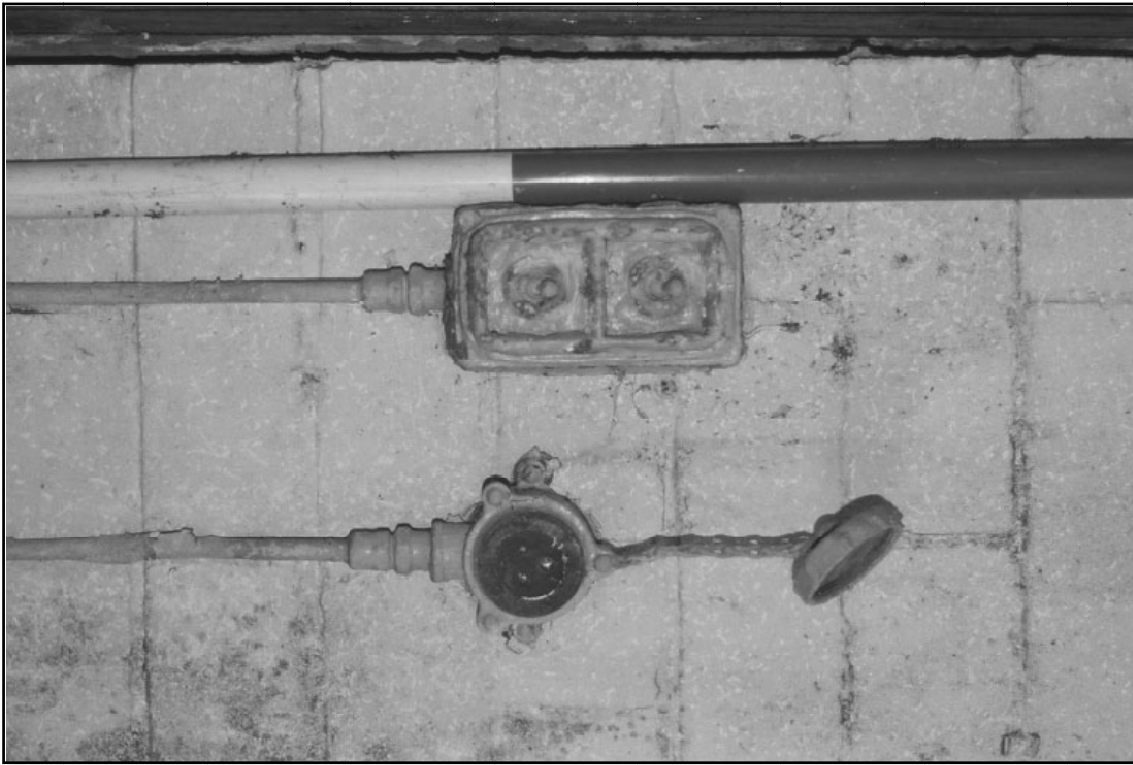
Detail of metal light switch to west of door in north wall of room 4 (film 10.26)
